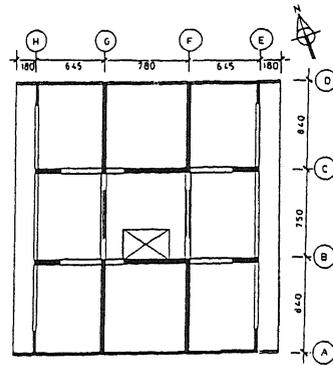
Floor plan of Torres del Sol building, levels 3 to 22.
